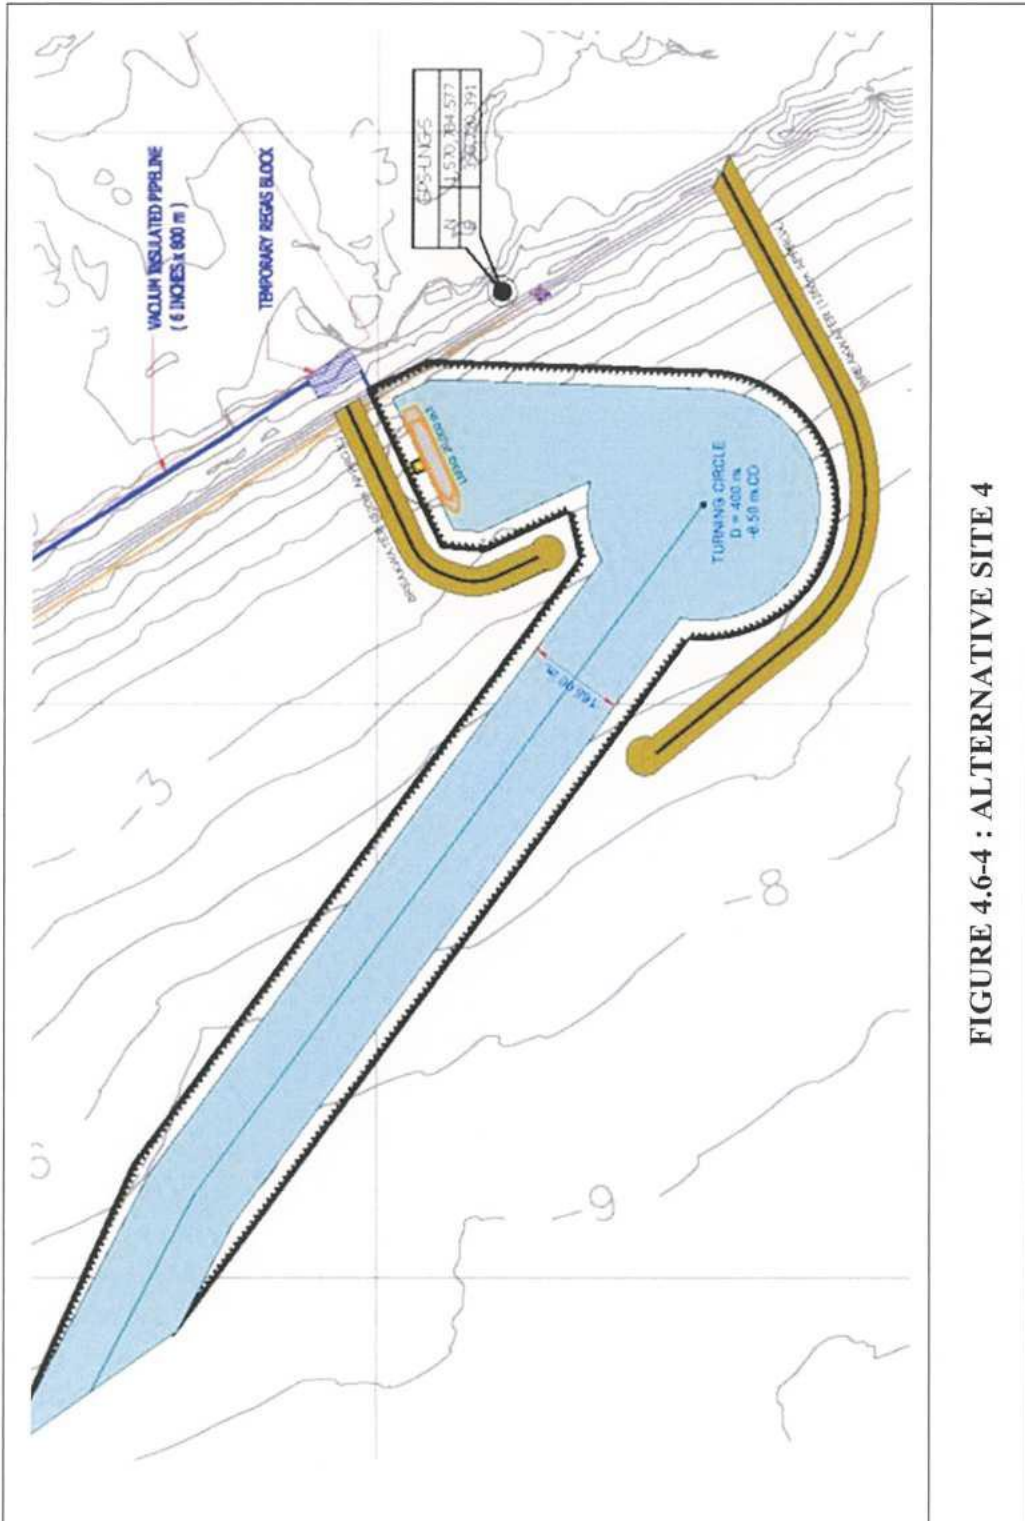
ALTERNATIVE SITE 4
